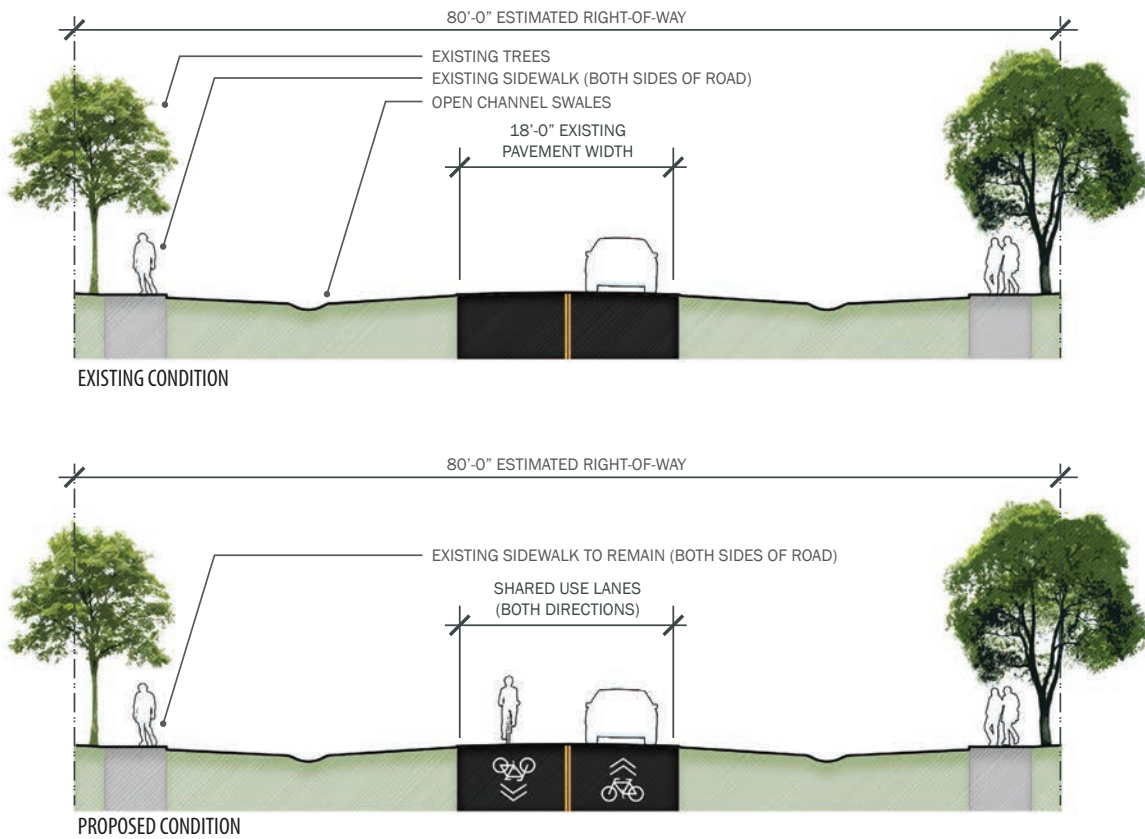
Cross-section study of existing and proposed conditions of typical corridor with 80' right-of-way
